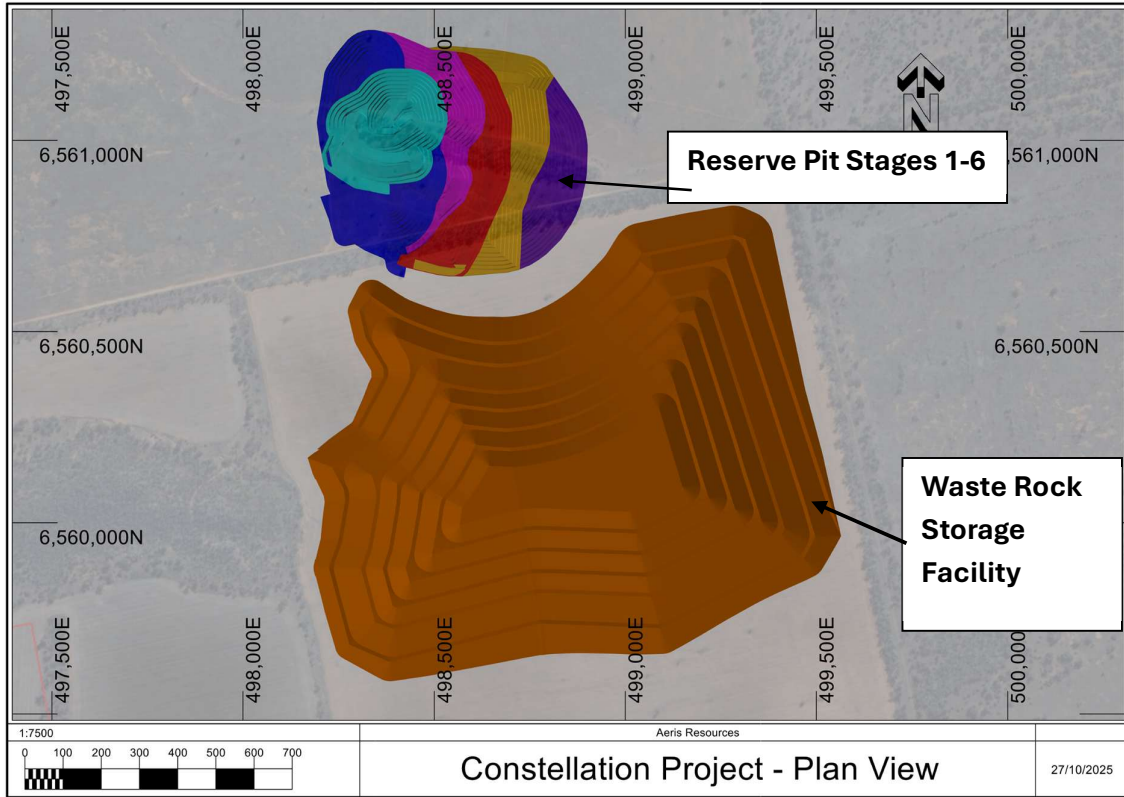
Plan view showing the 6 pit stages plus the waste rock storage facility.
